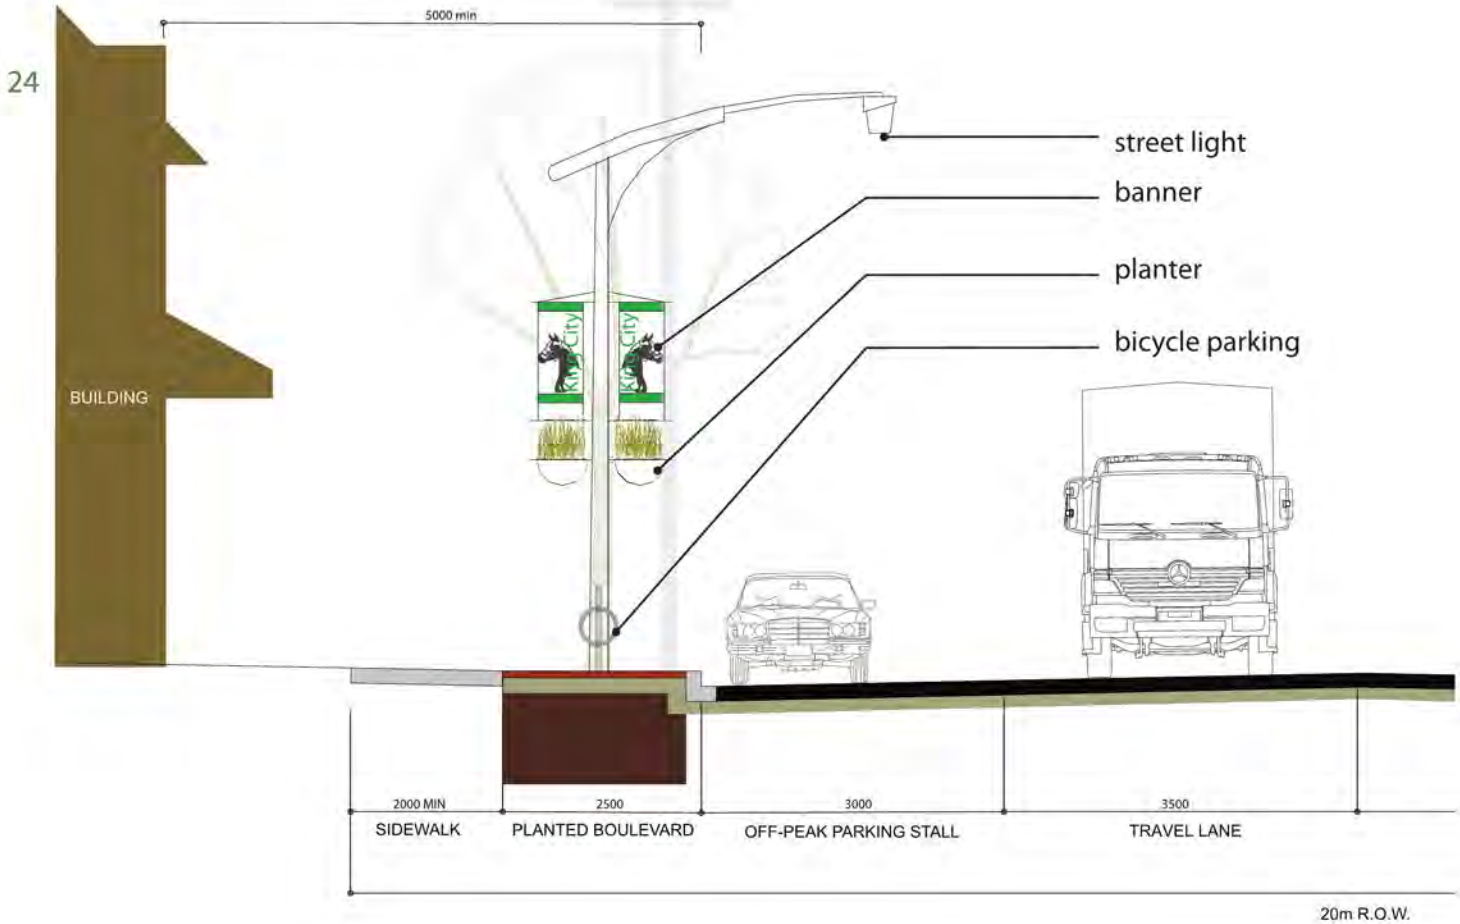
PROPOSED SECTION AT BLOCK REDEVELOPMENT AREAS
